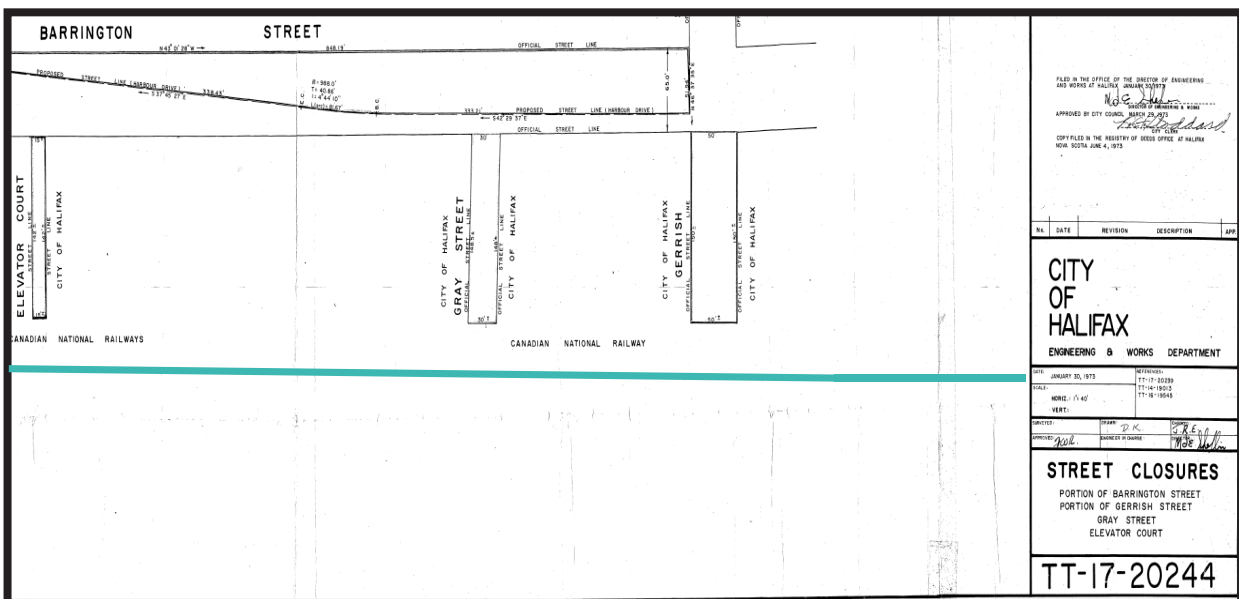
Street closure plan, 1973. Retaining wall highlighted in teal.
